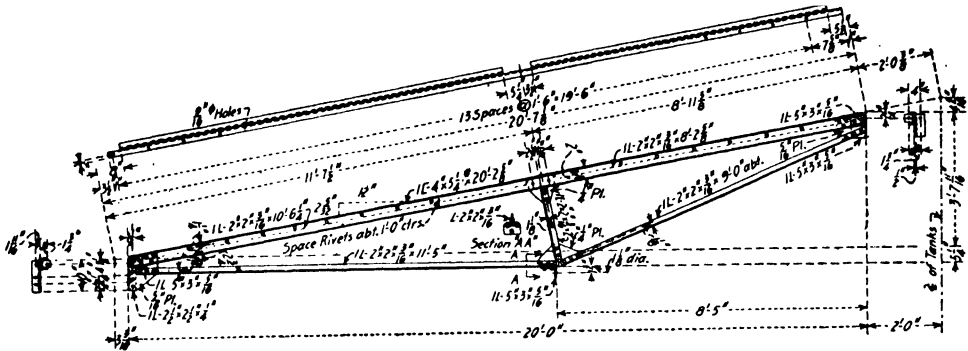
DETAILS OF STEEL ROOF TRUSS FOR STEEL BINS, INDEPENDENT ELEVATOR.
